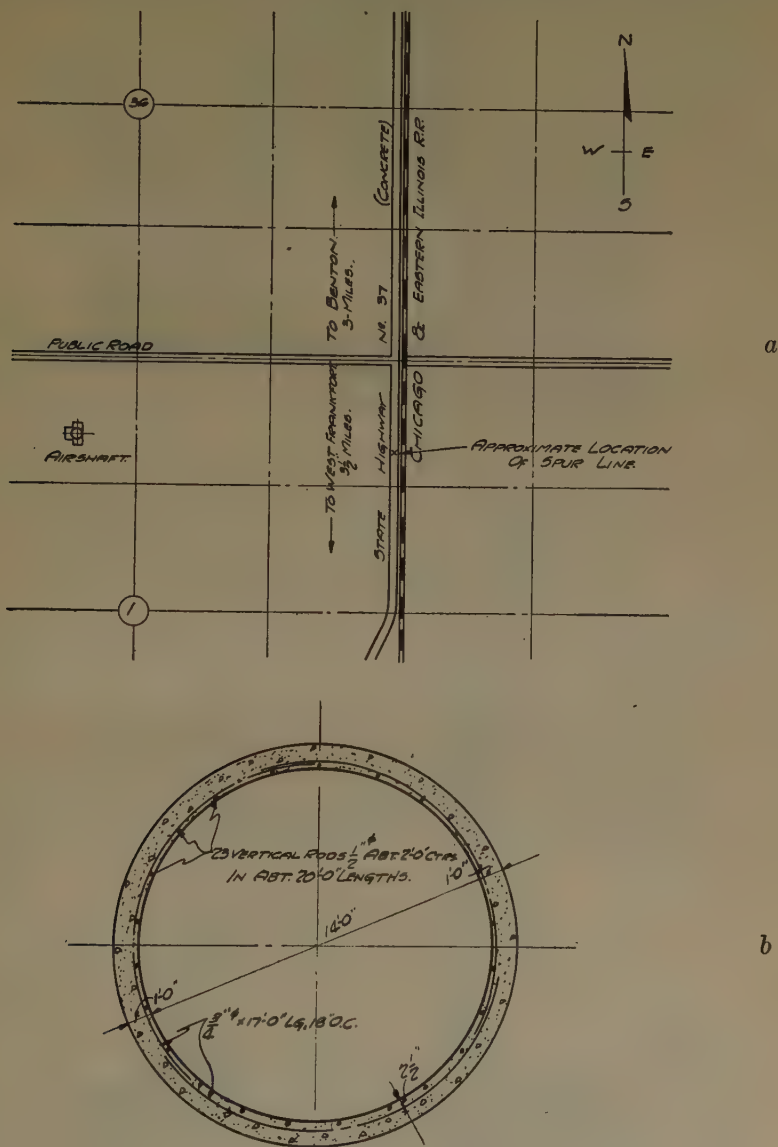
LOCATION SKETCH AND TYPICAL SECTION OF NEW AIR SHAFT, NEW ORIENT MINE.
